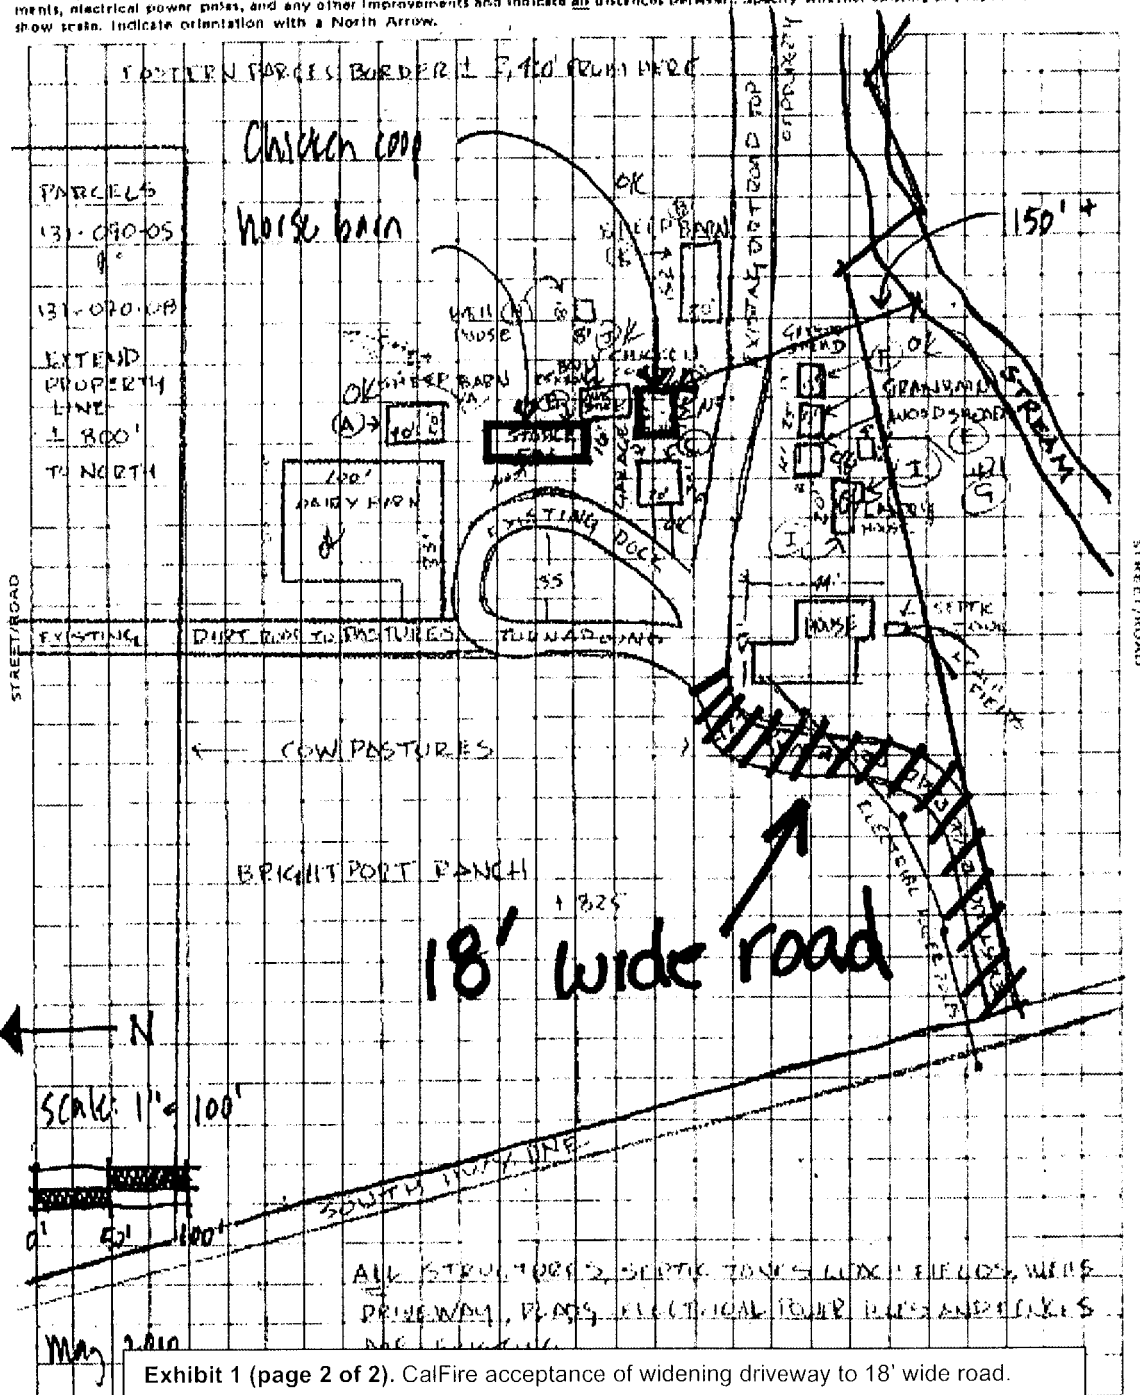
(page 2 of 2). CalFire acceptance of widening driveway to 18' wide road.
